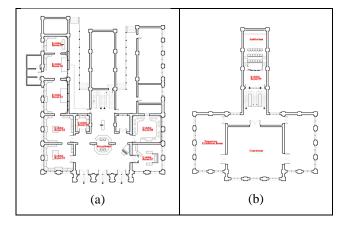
First Floor Plan - The eight exhibition rooms (a) and Second Floor Plan - The other exhibition rooms (b)
